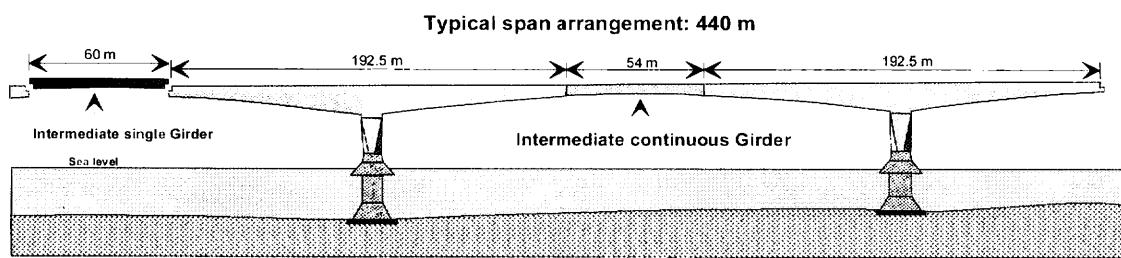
Span arrangement of the Confederation Bridge - Canada [20]
